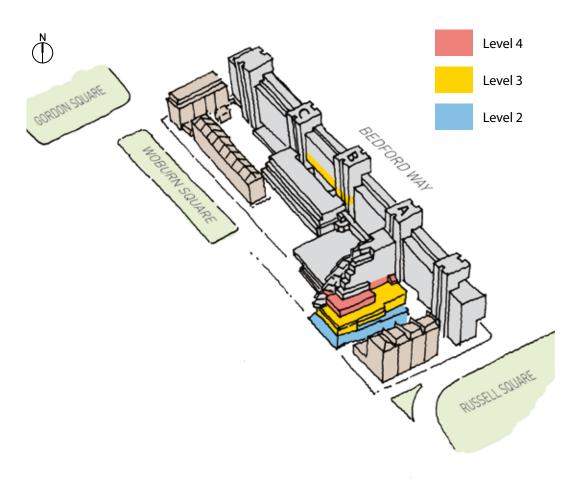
An aerial sketch of the building and relevant levels (ABA)
